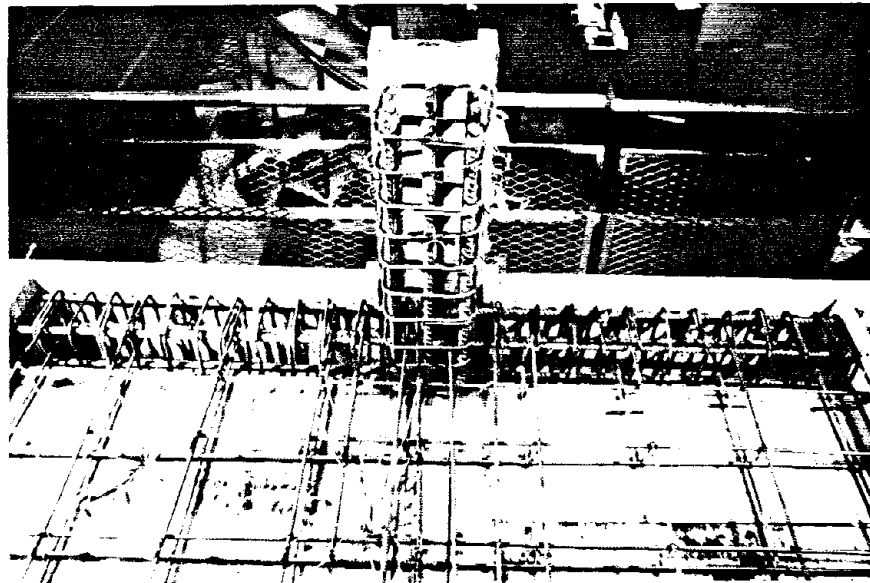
Specimen 3SE - Edge beam reinforcement
